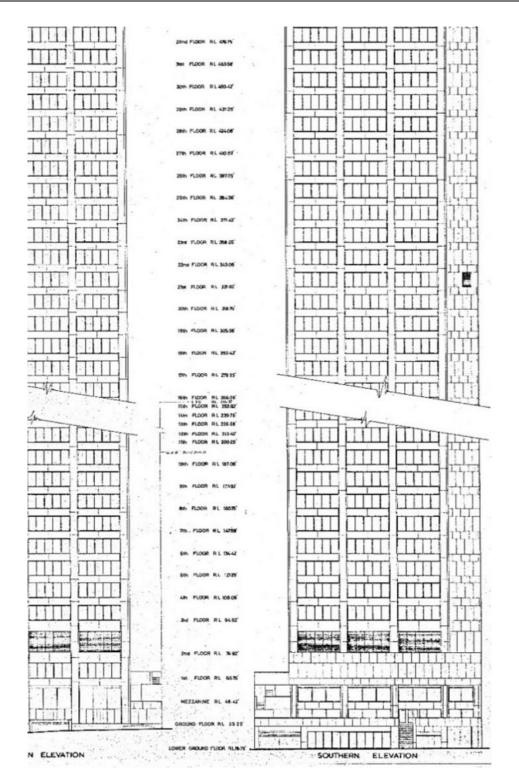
North elevation to Collins Street (left) and south elevation to Flinders Lane (right). Drawings by Bates Smart & McCutcheon, dated January 1972 (BAP).
